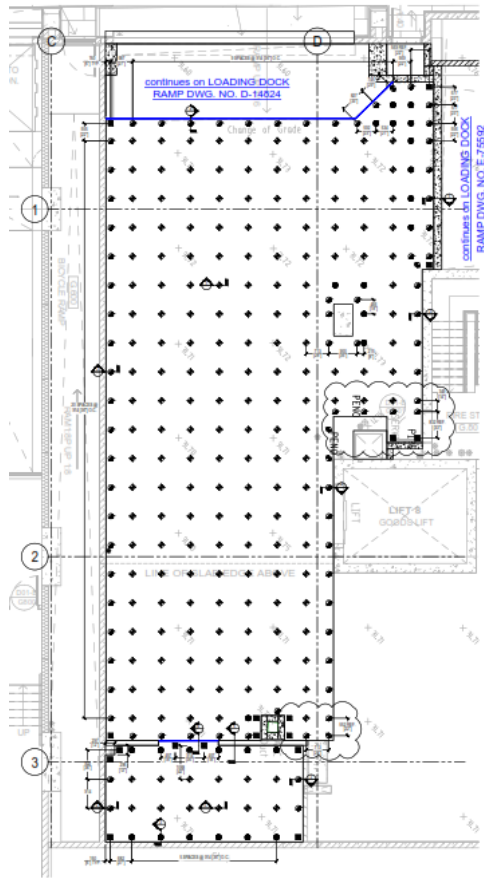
Natural Rubber Bearing layout of Jack up Floating Floor
